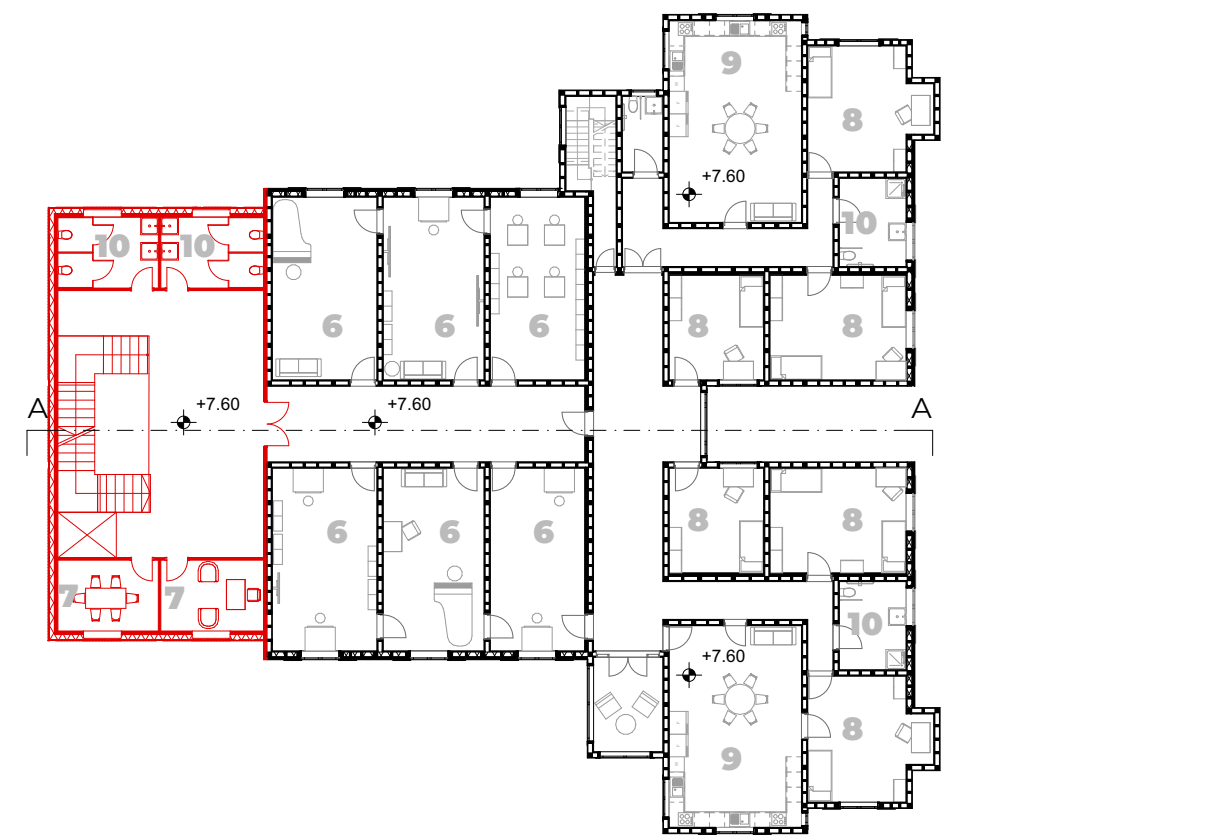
First Floor Plan (Source: Created by the author, 2025)
